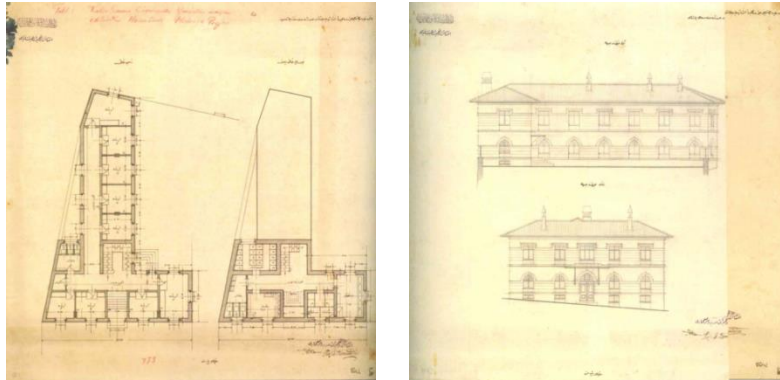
a)Hasanzade Madrasa Basement and Ground Floor Plan, b) Hasanzade Madrasa Facades[51]
